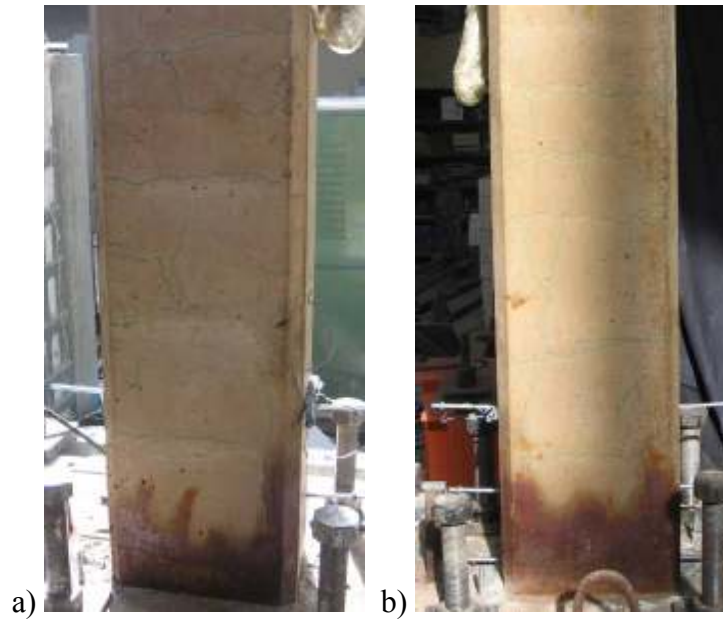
Pattern of cracks formed due to corrosion: (a) North, (b) South.
